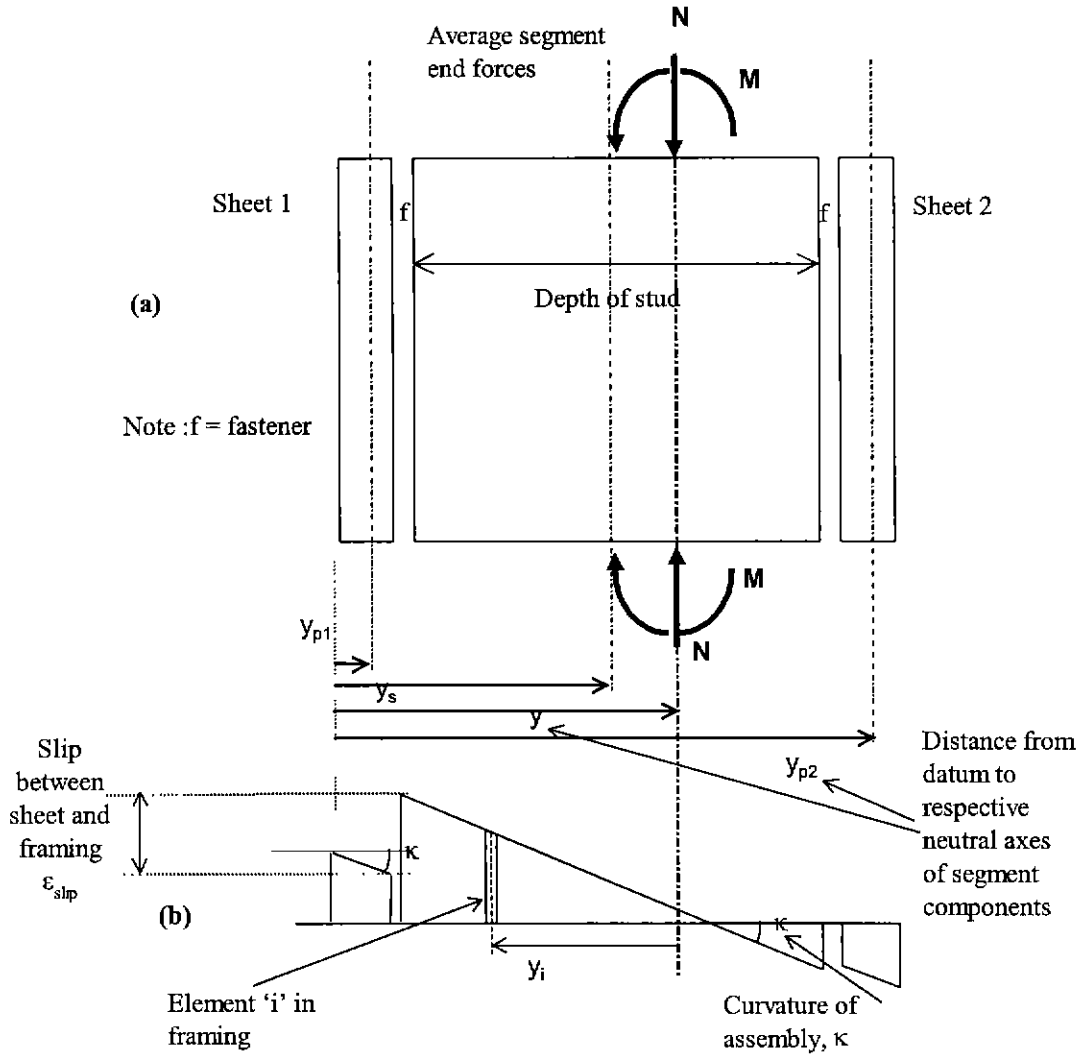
(a) Part Vertical Section through Stud in Wall
